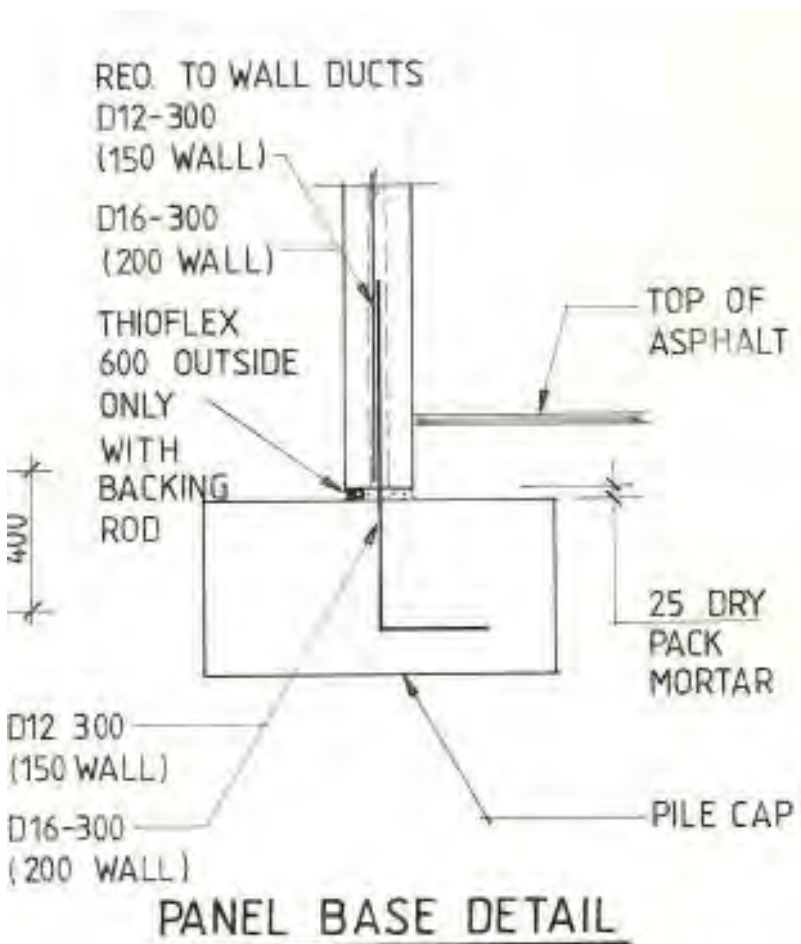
Extract from the as-built drawingS7 - showing the connection between precast concrete wall panel and footing
